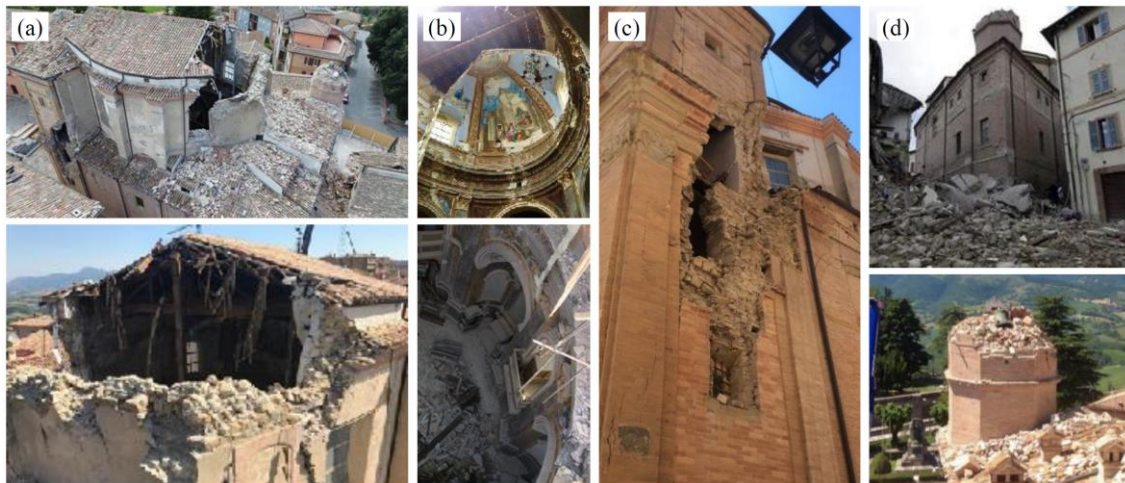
Earthquake damage: (a) collapse of the tiburium, (b) collapse of the dome and interior damages, (c) façade overturning mechanism, (d) collapse of the bell tower.
